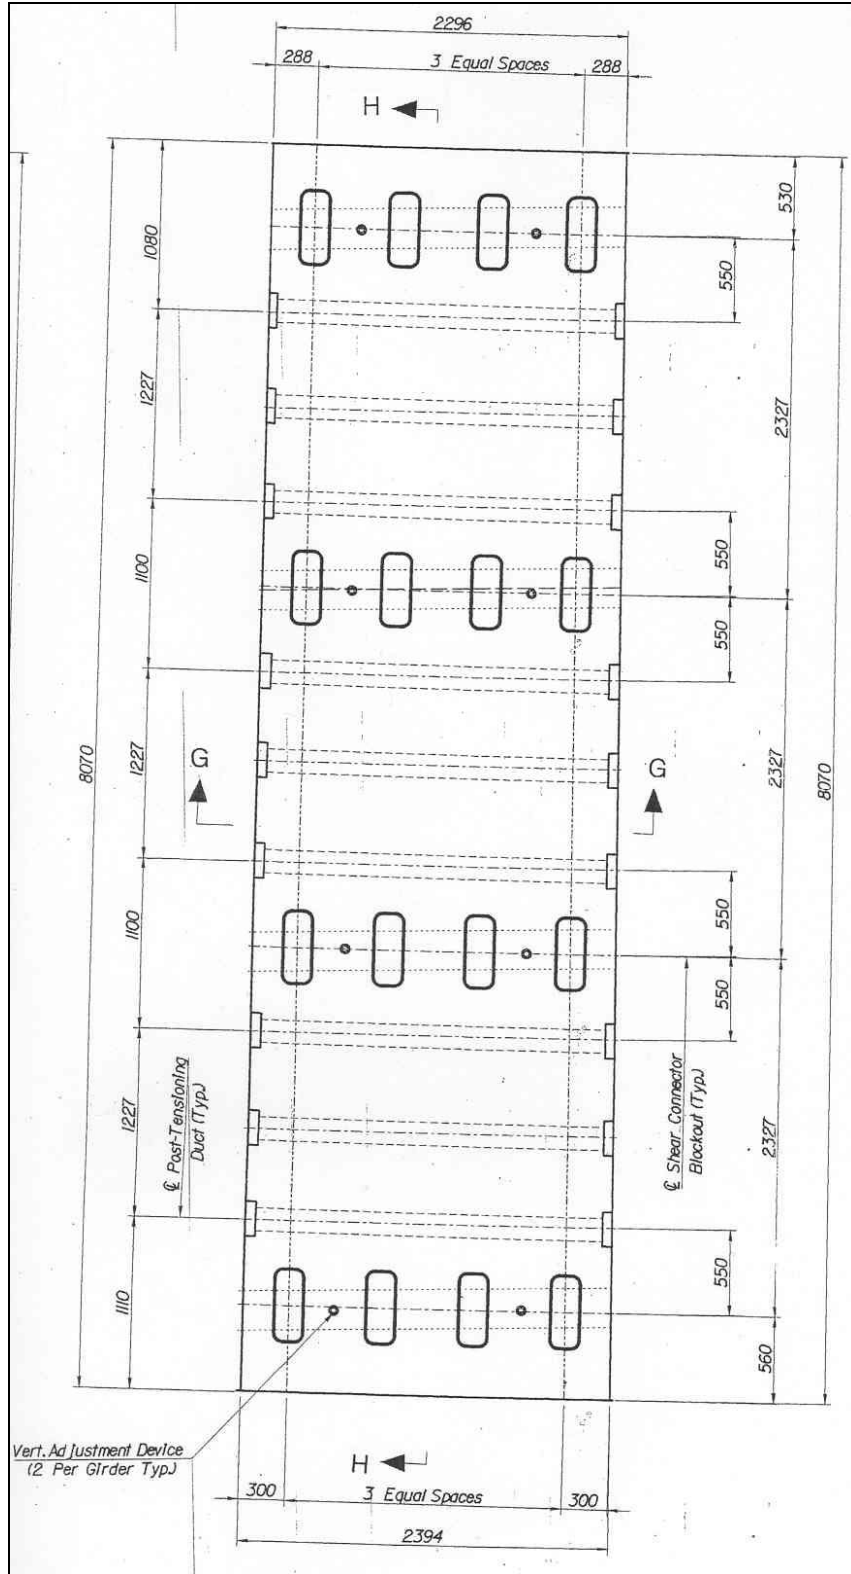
Trapezoidal precast slab plan for a bridge in West Hartford, CT (CT-DOT, 1997)
